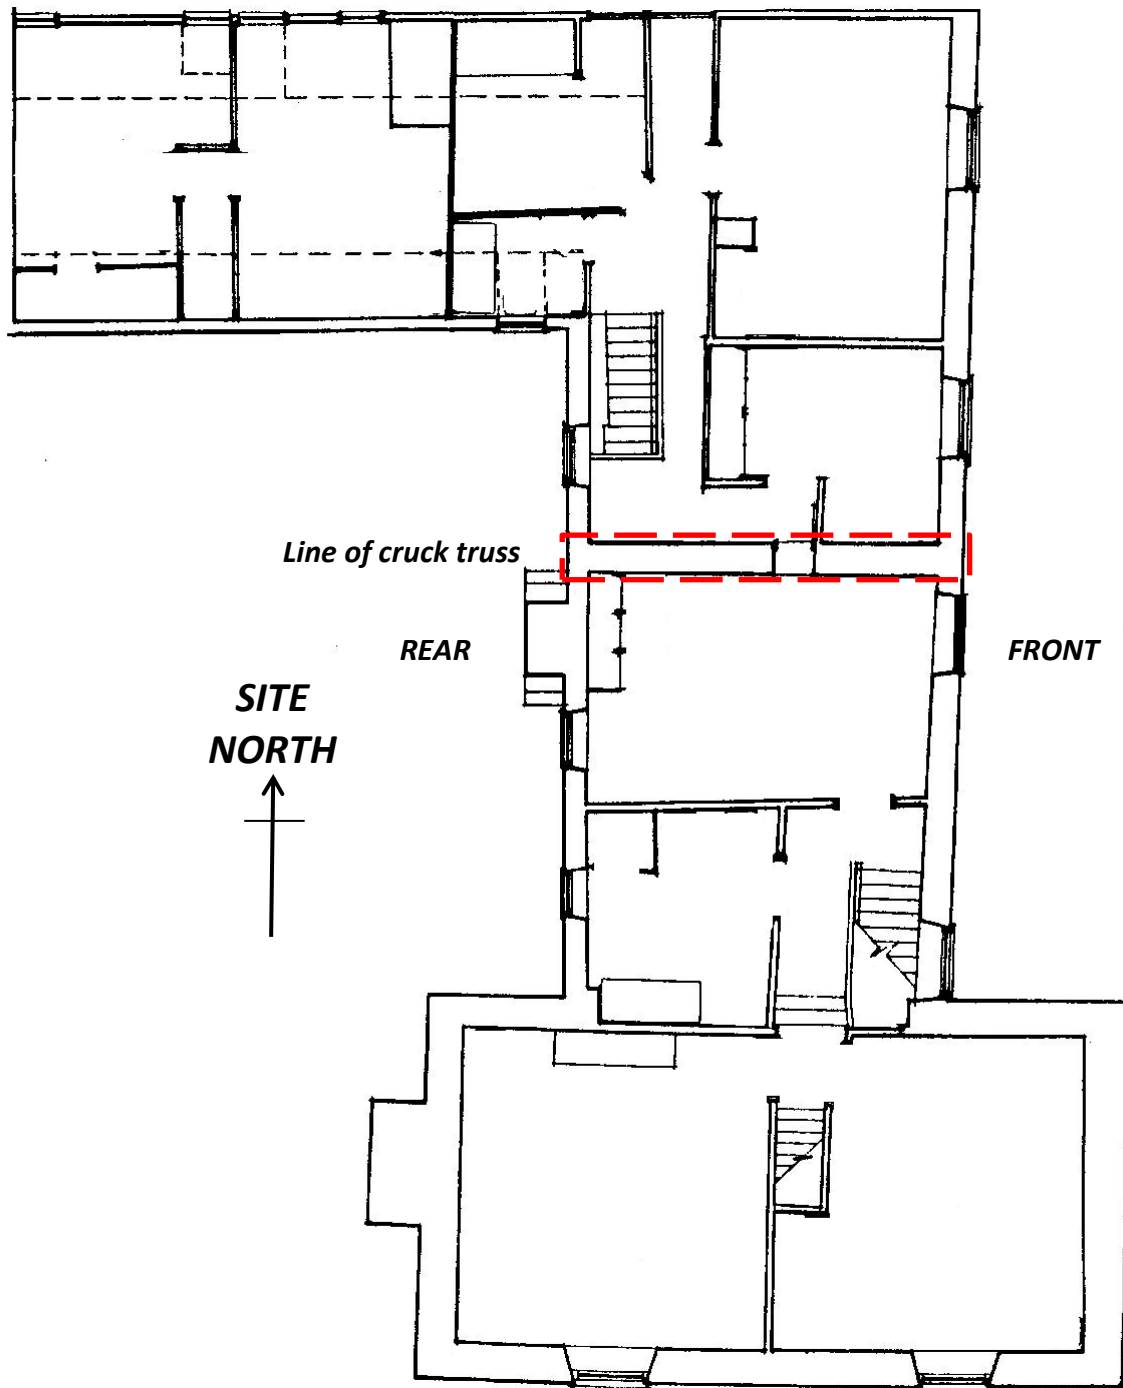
Plan of Lower Hope Farmhouse at first floor level to show position of the cruck truss within the building (courtesy of Mr Clive Richards)
